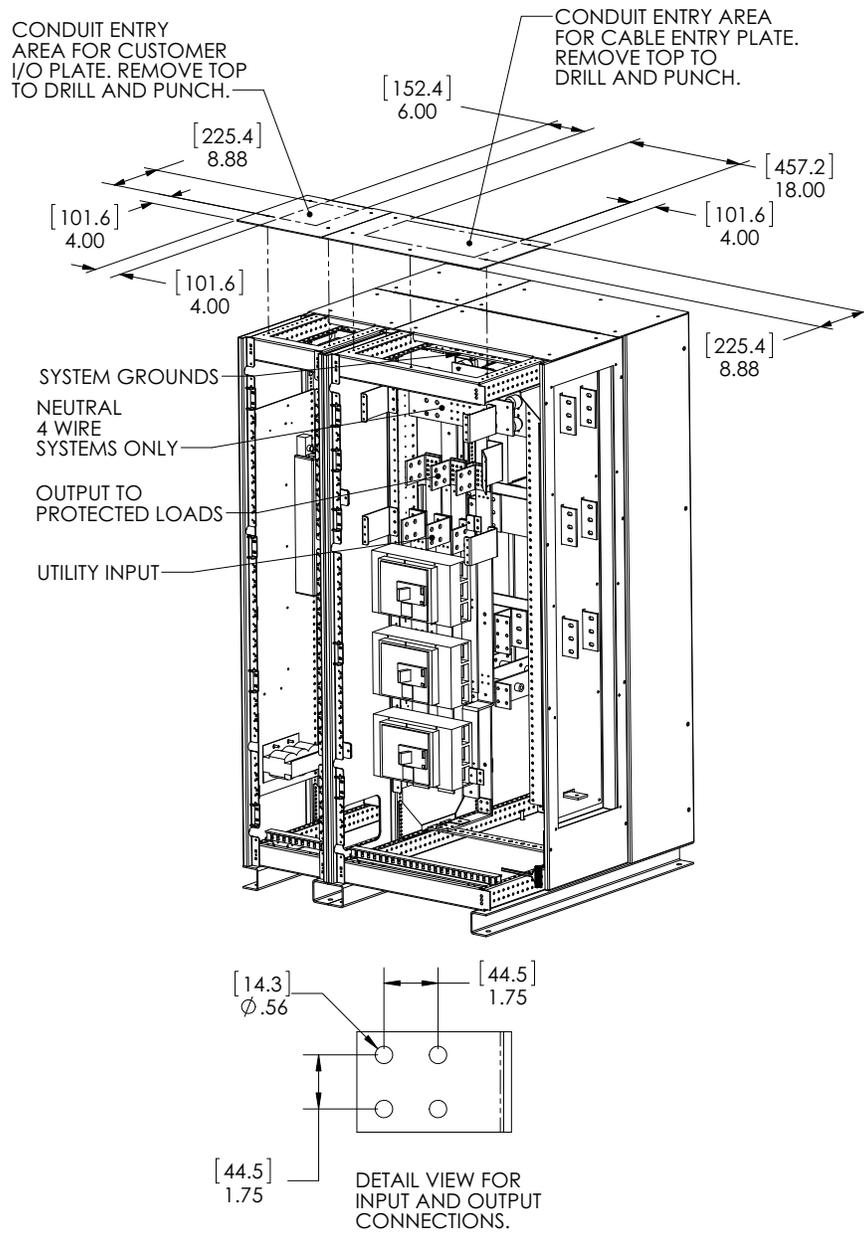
Automatic Bypass Switchboard Terminations and Conduit Landing Areas
